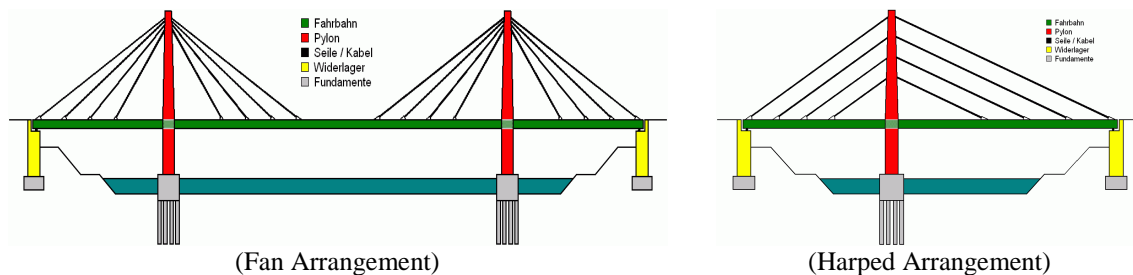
Arrangement of Cables in Cable Stayed Bridges
